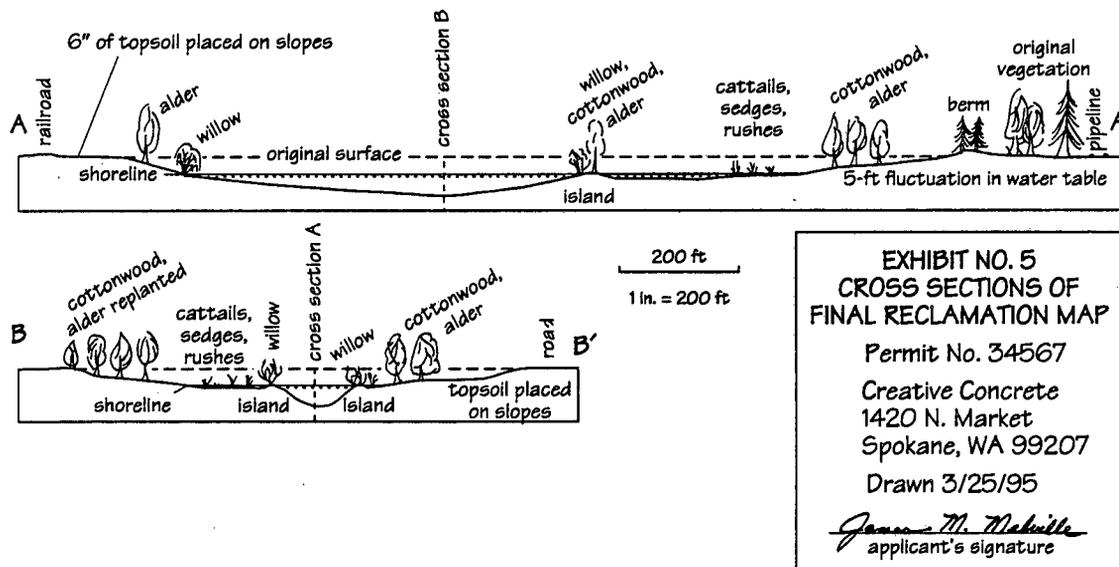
Cross sections for the final reclamation plan of the mine shown in Figure 1.4. The types and placement of vegetation and the slope of the pond banks are shown. (Modified from Norman and Lingley, 1992. Not to scale; this map has been reduced to fit on the page.)
